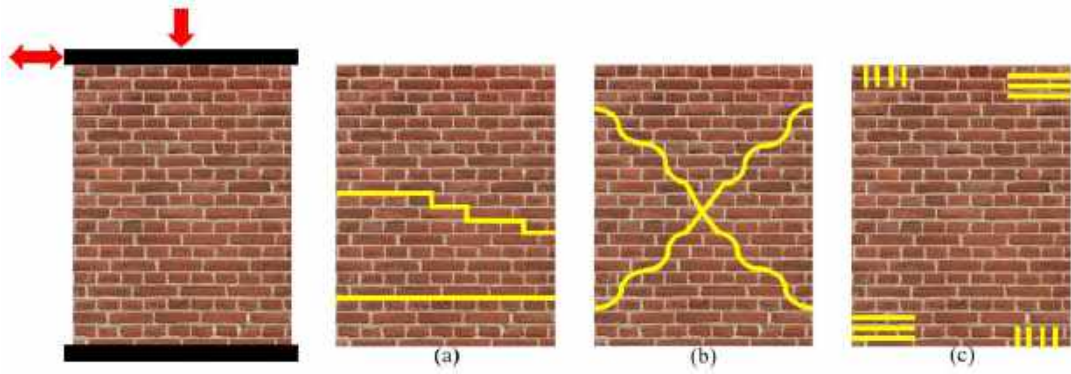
Crack patterns of a URM wall subjected to axial and cyclic lateral loadings for the (a) shear sliding (b) diagonal cracking, and (c) rocking failure modes (adapted from Paper III).
